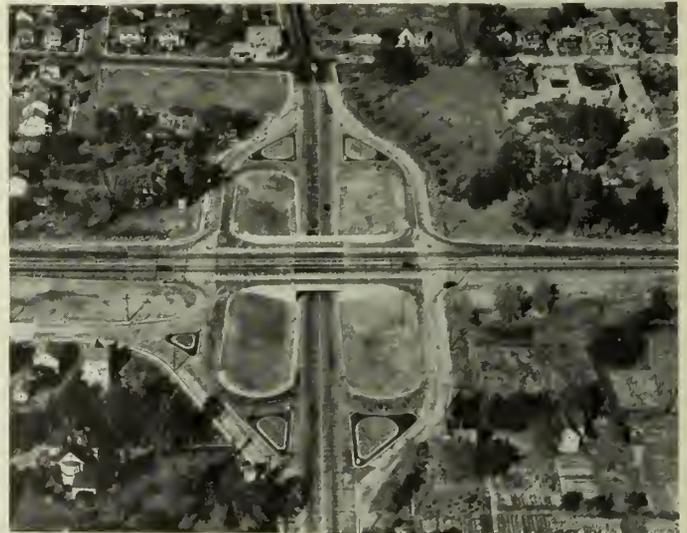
Intersection of Route Carrying Traffic for George Washington Bridge and Teaneck Road, Teaneck, N.J.
